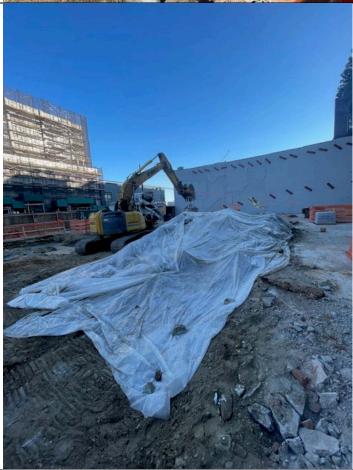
View of breaking bedrock in the western side of the site. Photo 4: View of poured footings.
